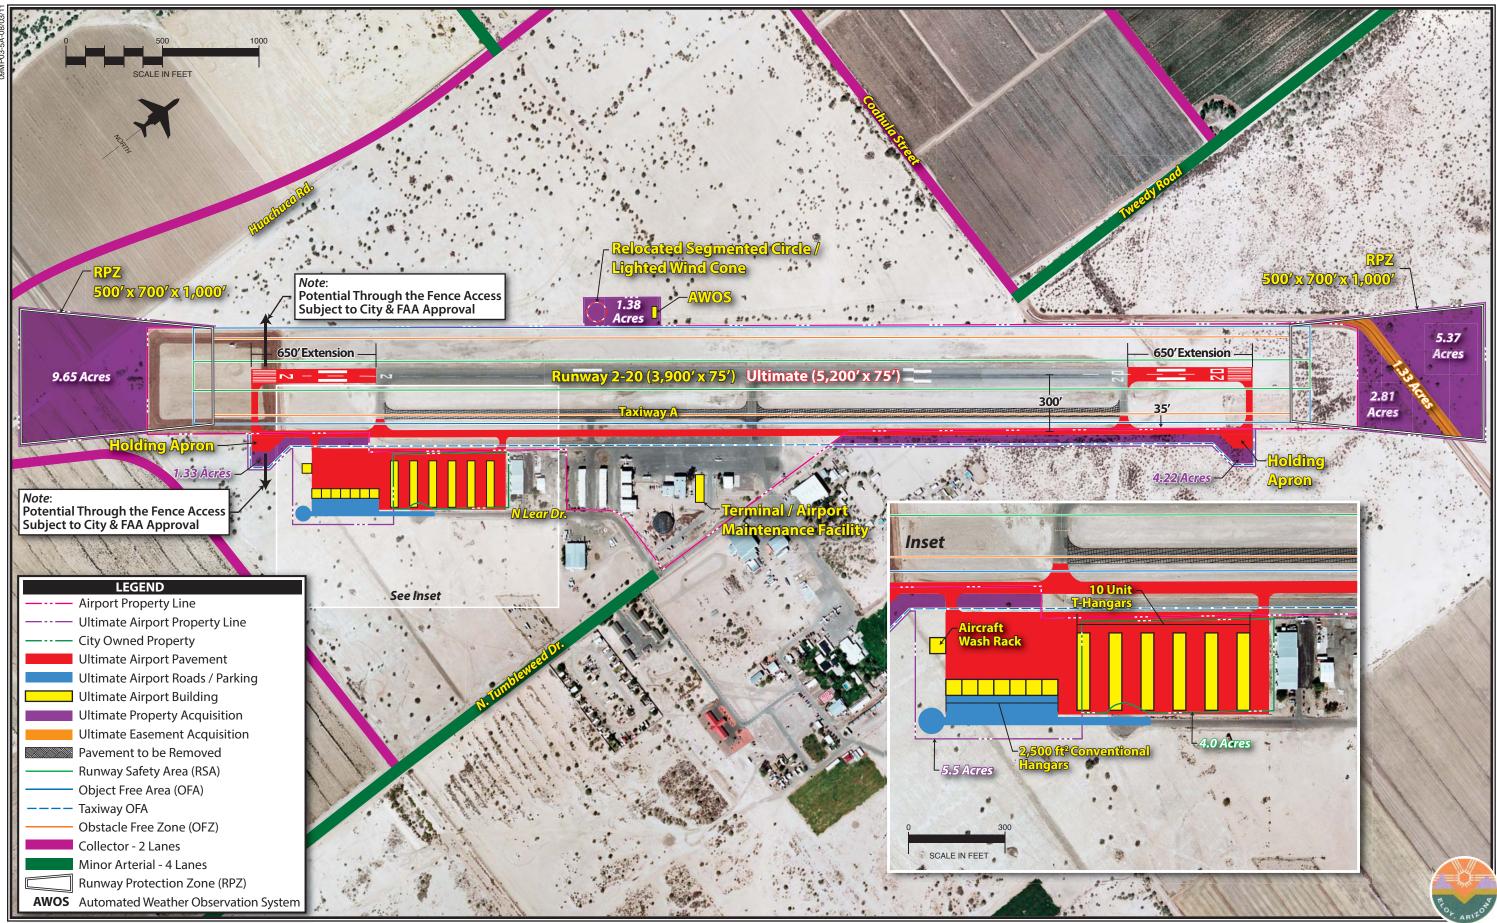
A RECOMMENDED MASTER PLAN CONCEPT
